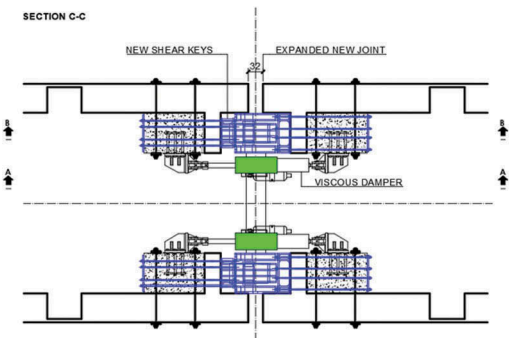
Project configuration: overview of deck horizontal section – New shear keys and viscous dampers.
